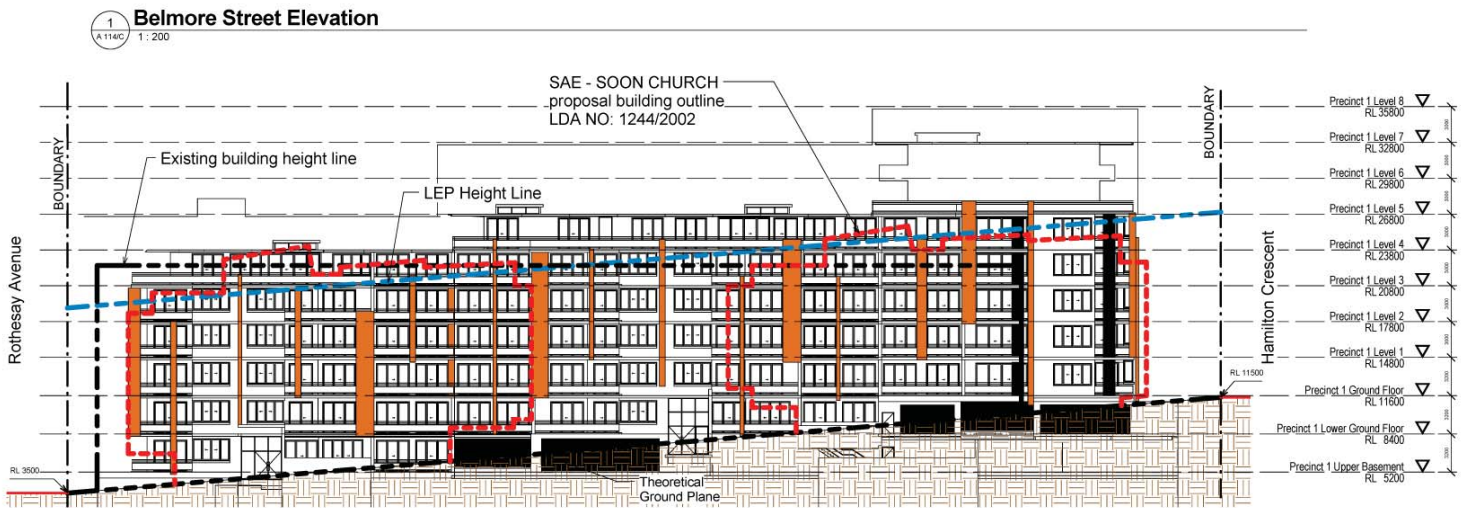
BELMORE STREET ELEVATION ILLUSTRATING EXISTING, APPROVED, LEP AND PROPOSED BUILDING HEIGHT
